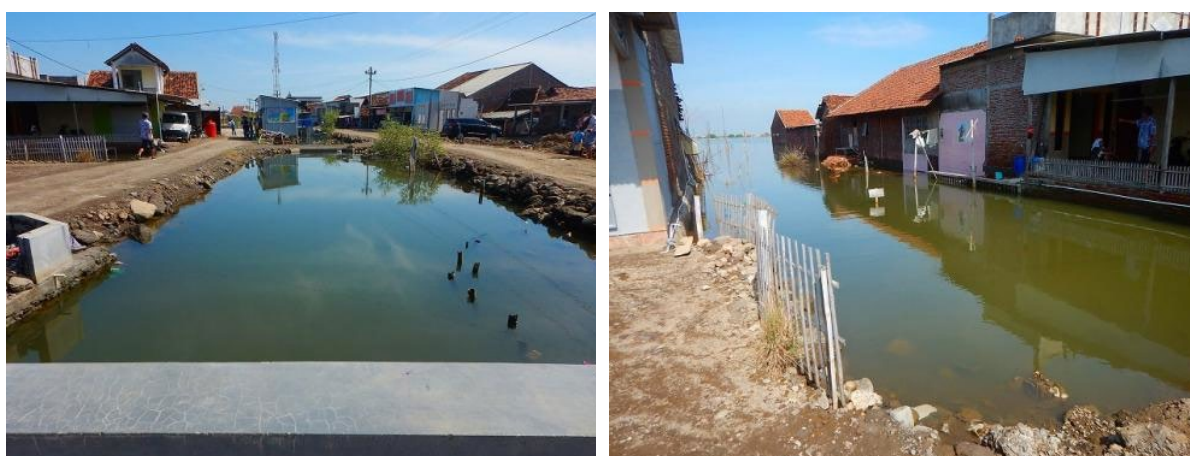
No Clearance Bridge and Houses over the Channel (left) and Houses about to be Submerged (right)
